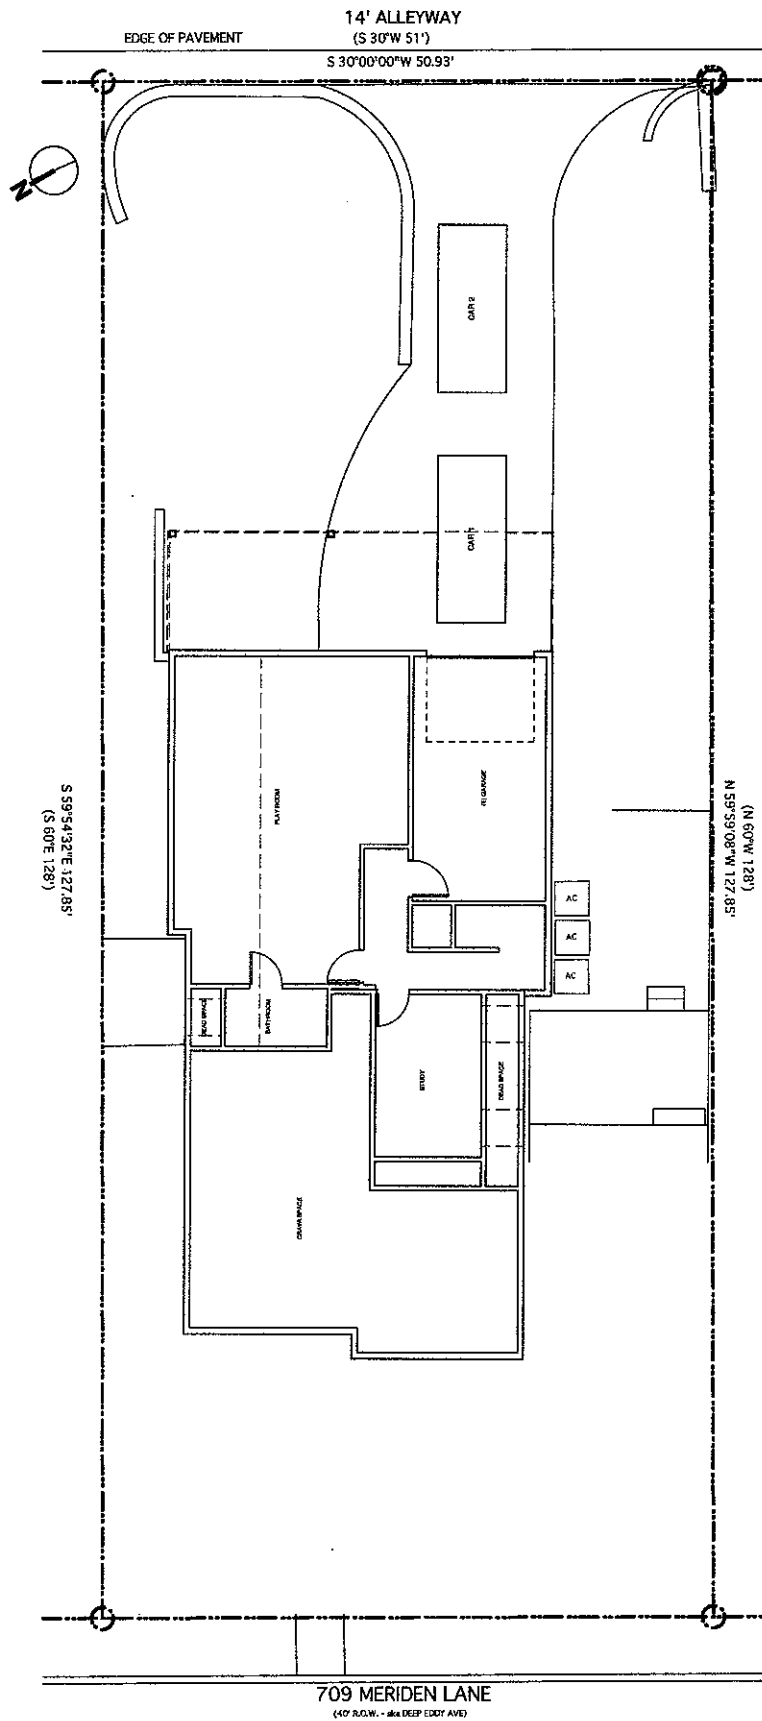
Existing basement-level plan showing driveway parking spaces.
